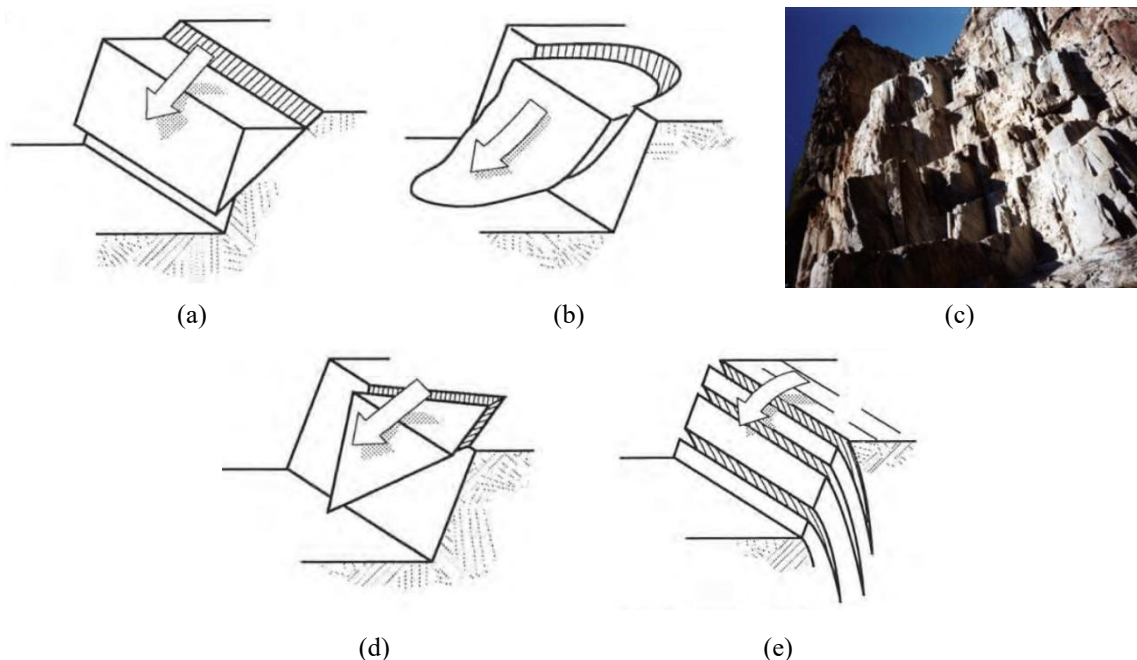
Types of jointed rock slope failures: (a) Plane failure; (b) Circular failure; (c) Stepped failure surface formed by the Randa rock avalanche; (d) Wedge failure; (e) Toppling failure. (Hoek & Bray, 1981; Zhu, 2017)
